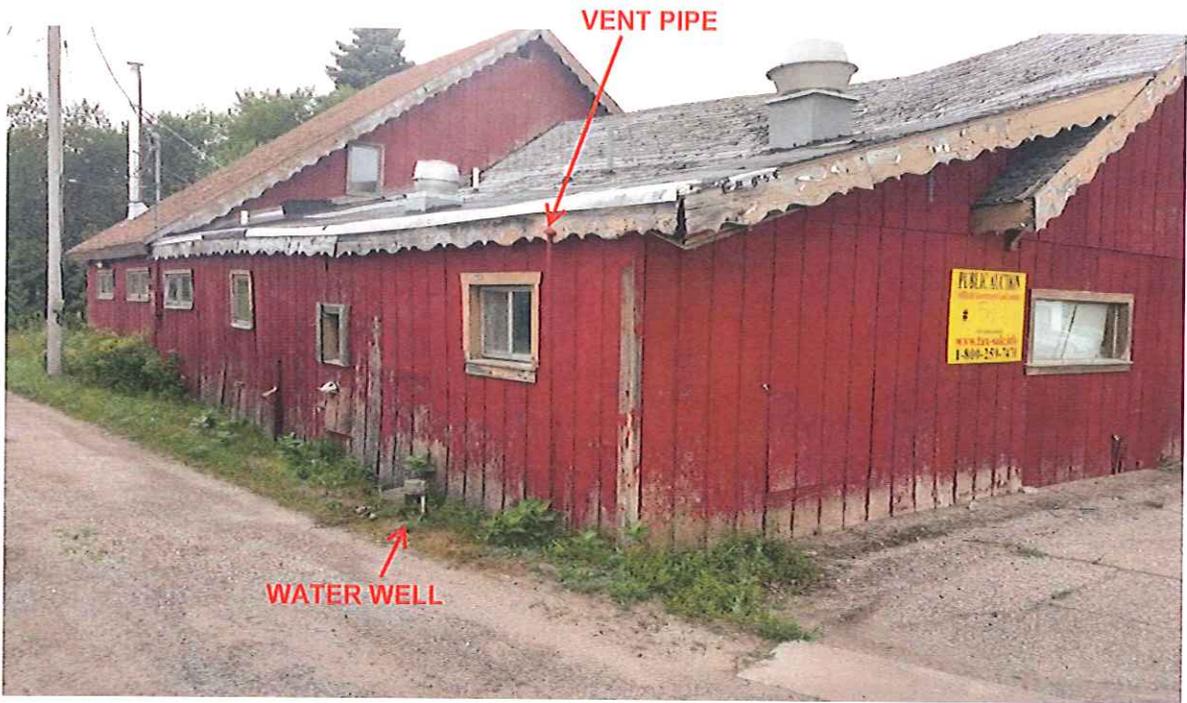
View of unknown vent pipe and water well location along south side of building.
